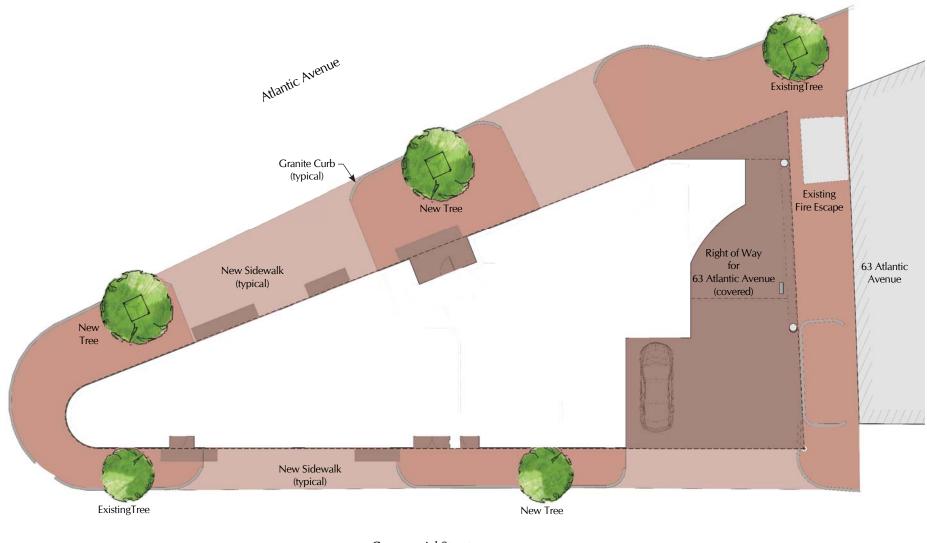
Chapter 91 Site Plan Source: Vanasse Hangen Brustlin, Inc., 2015
